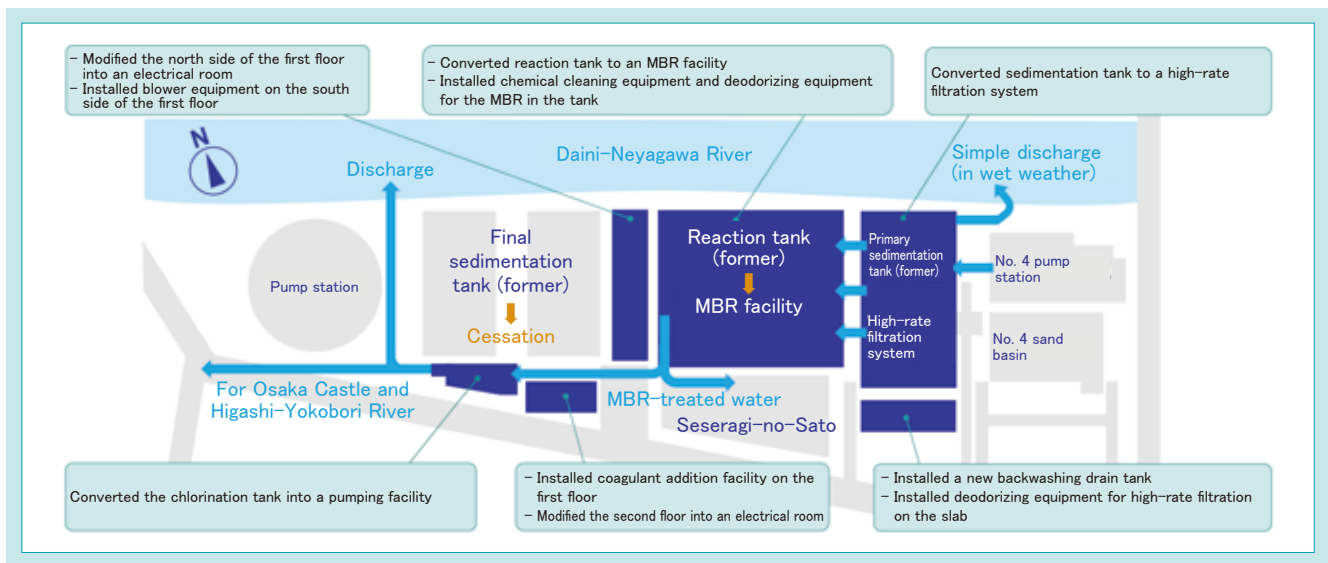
Overview of Nakahama Sewage Treatment Plant Reconstruction
